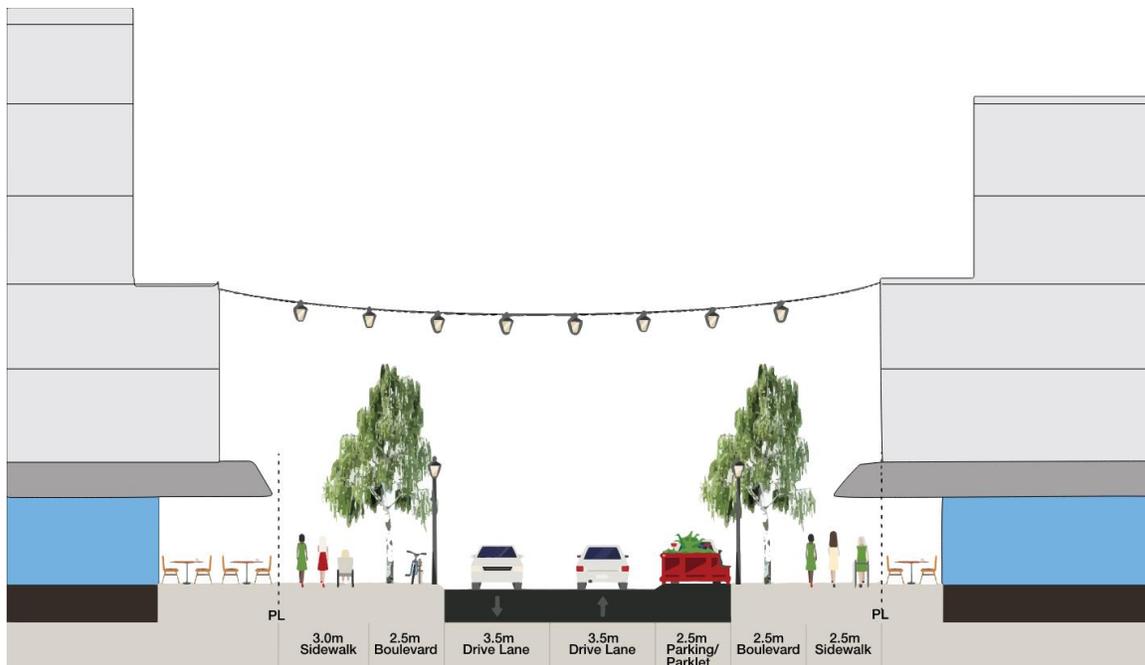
Oak Street Conceptual Cross Section (UDP)
